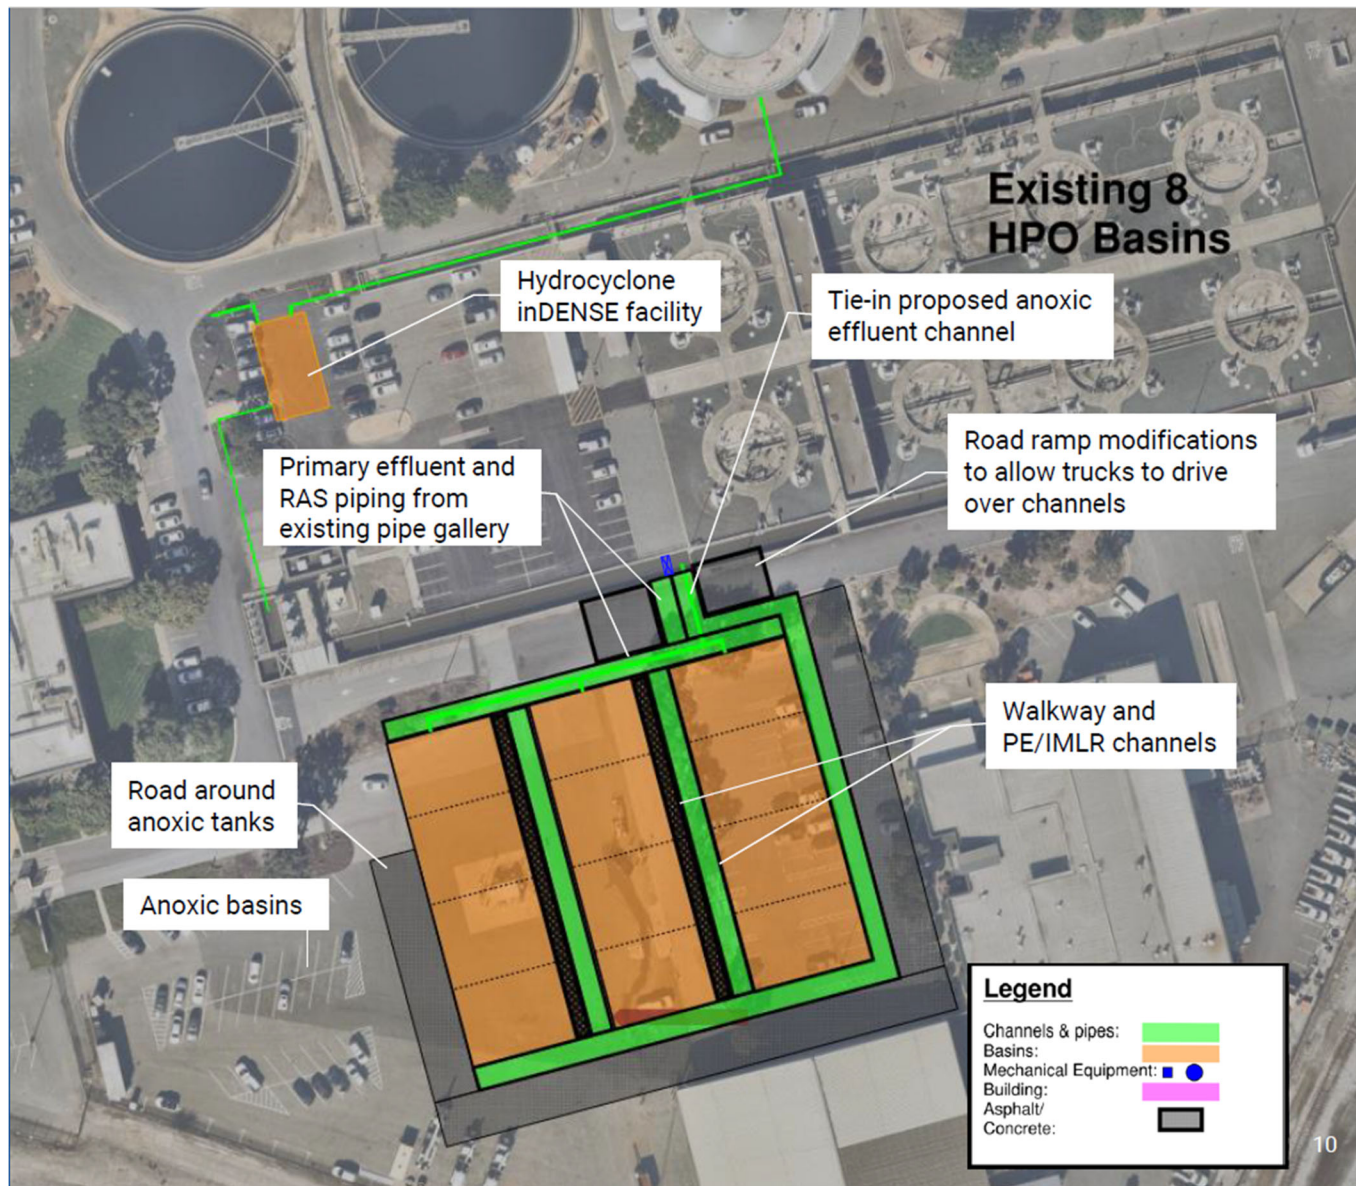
EBMUD MWWTP site plan and facilities impacted by Project
